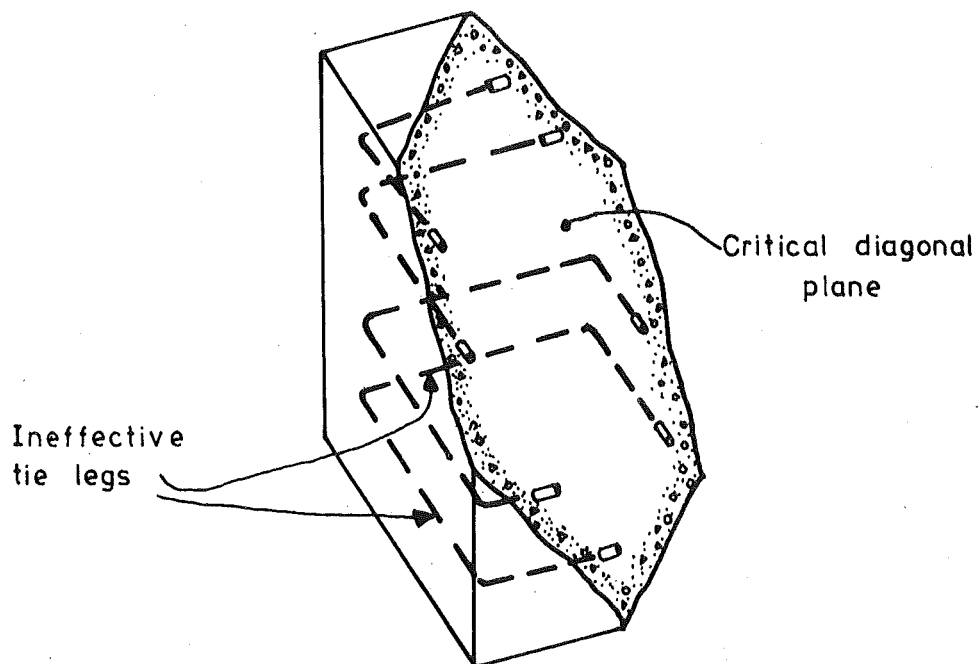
CRITICAL PLANE FOR SPACE FRAME JOINT
